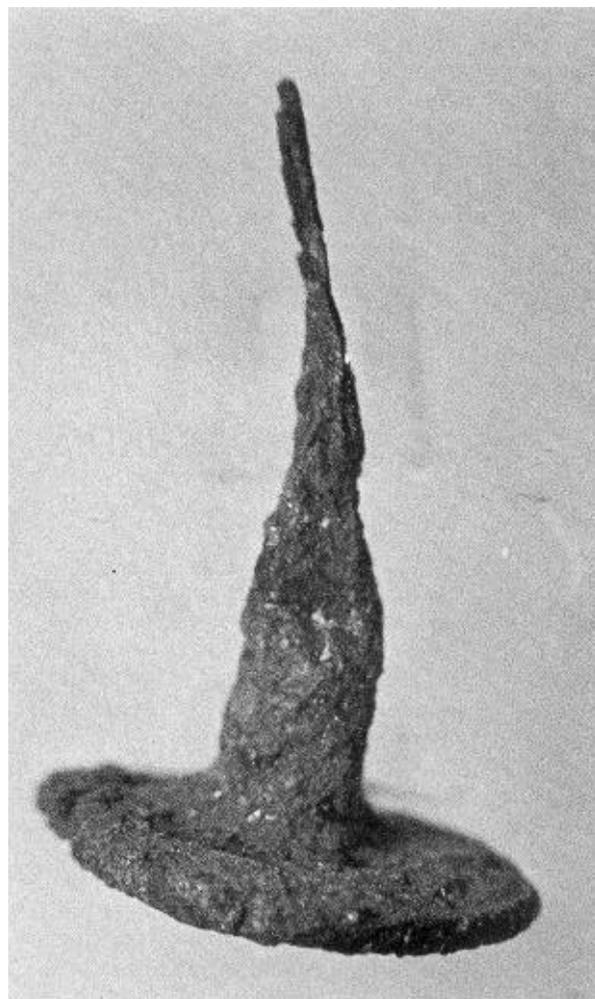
Nail removed from barn siding shows crevice corrosion. (Note that shank has corroded away, whereas head and upper part of shank remain.) (M141 788-8)
